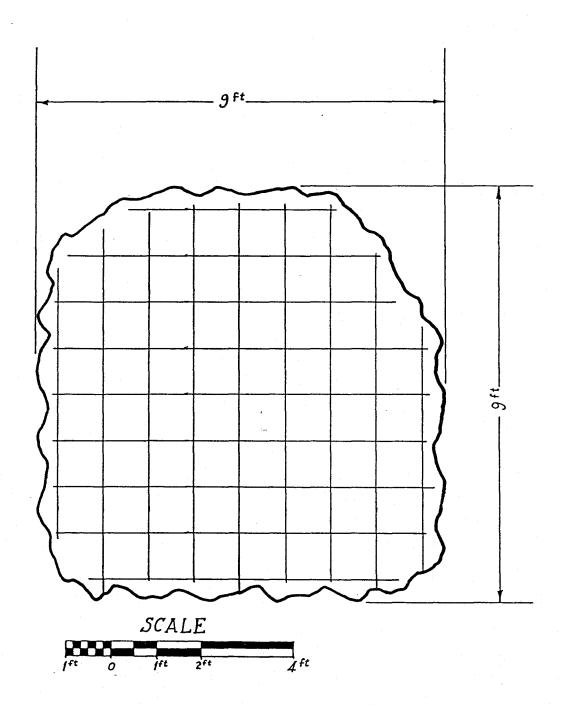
Air-side rebar cage (mat) for flexural reinforcement in the B-Level Brenneman/Sunnyside Connection, #6 bars, 12-in. spacing, 3.5-in. minimum depth of cover.
